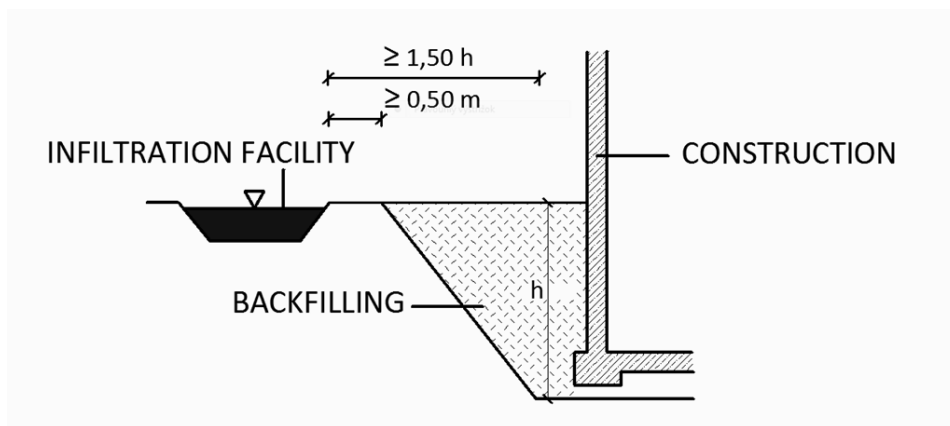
The minimum distance of the decentralized infiltration facilities from building without waterproofing [based on 1]
